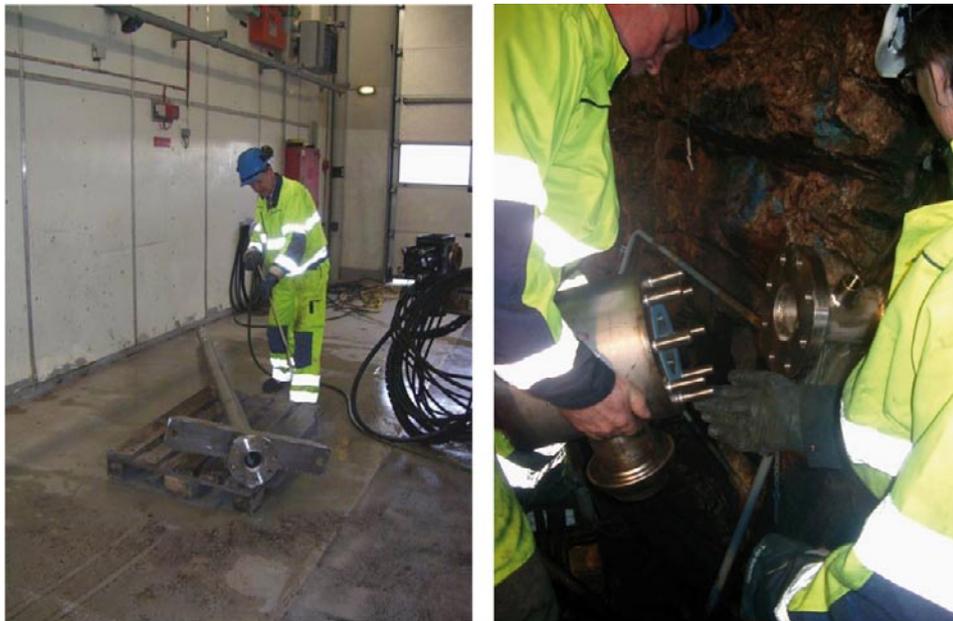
B. Left. Cleaning with hot water on ground of the 3 m stainless steel casing. Right. Bolting of the casing to the rock wall after gap grouting in the pre-drilled borehole.
